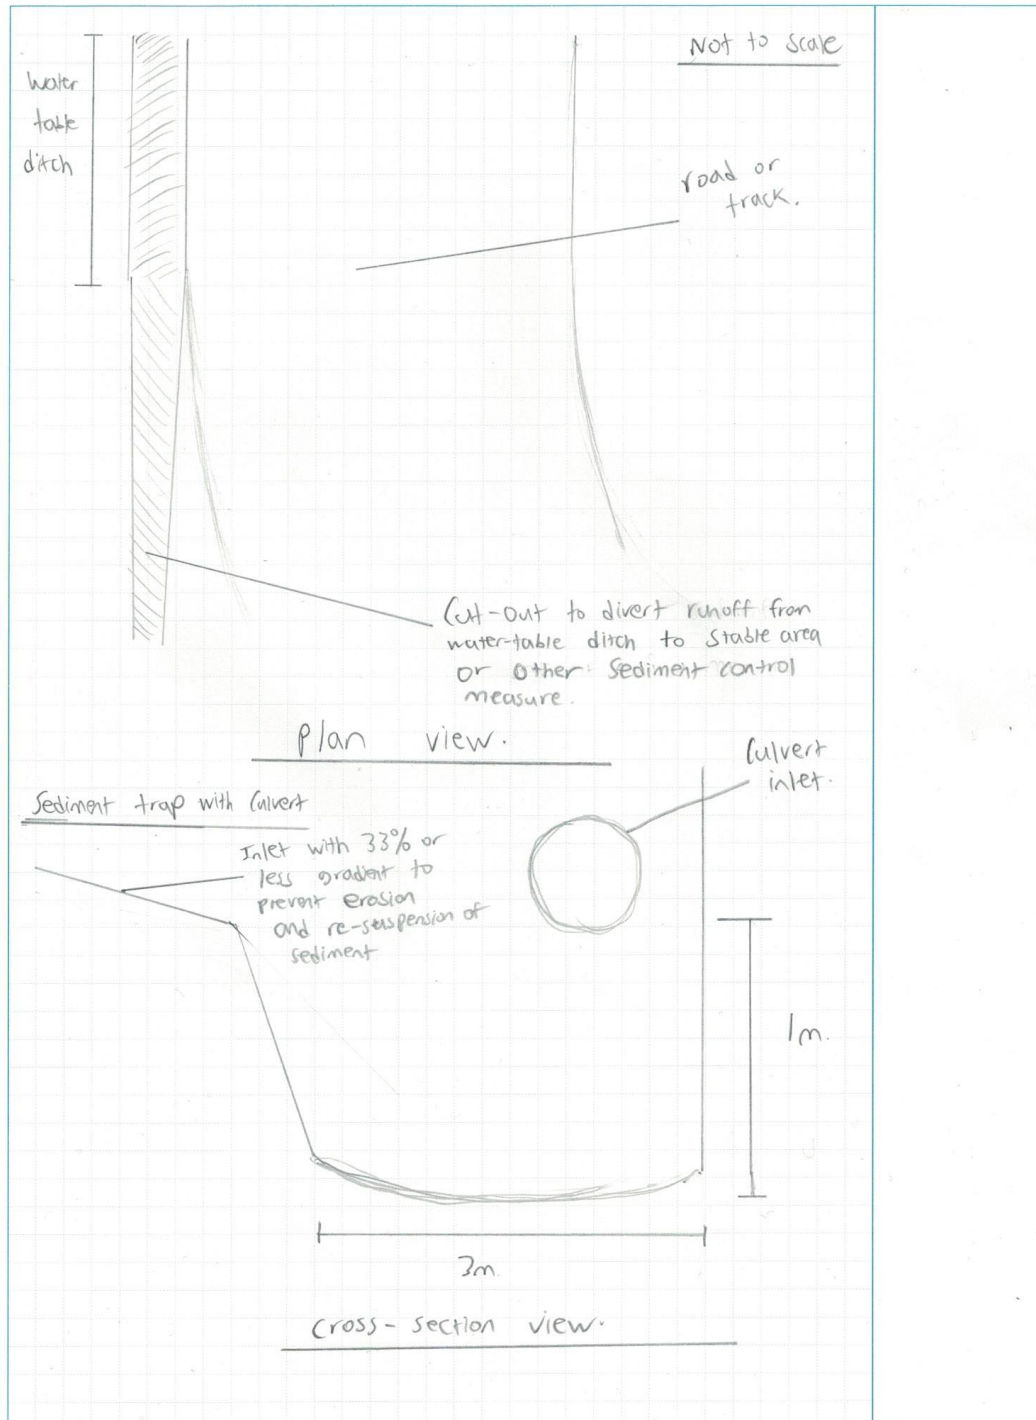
Plan view of cut-out and cross-section view of sediment trap with culvert
